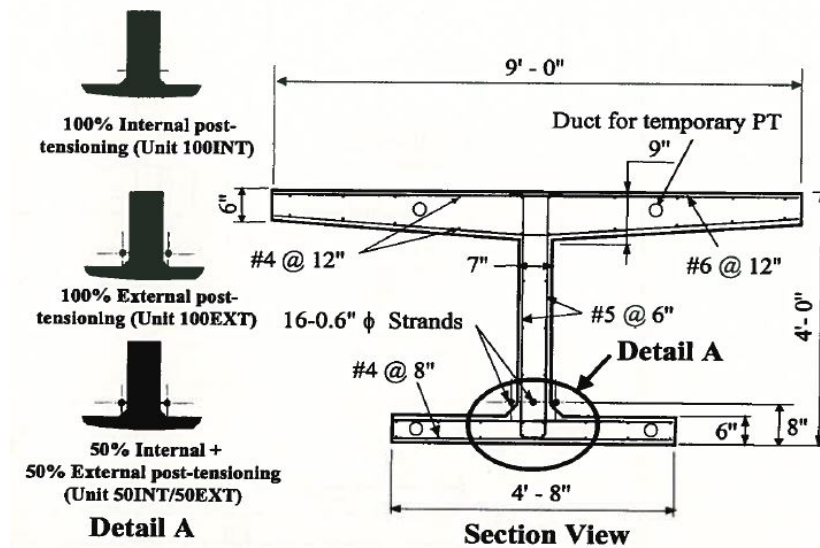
Cross-Section of Girders Tested by Megally (2003)
